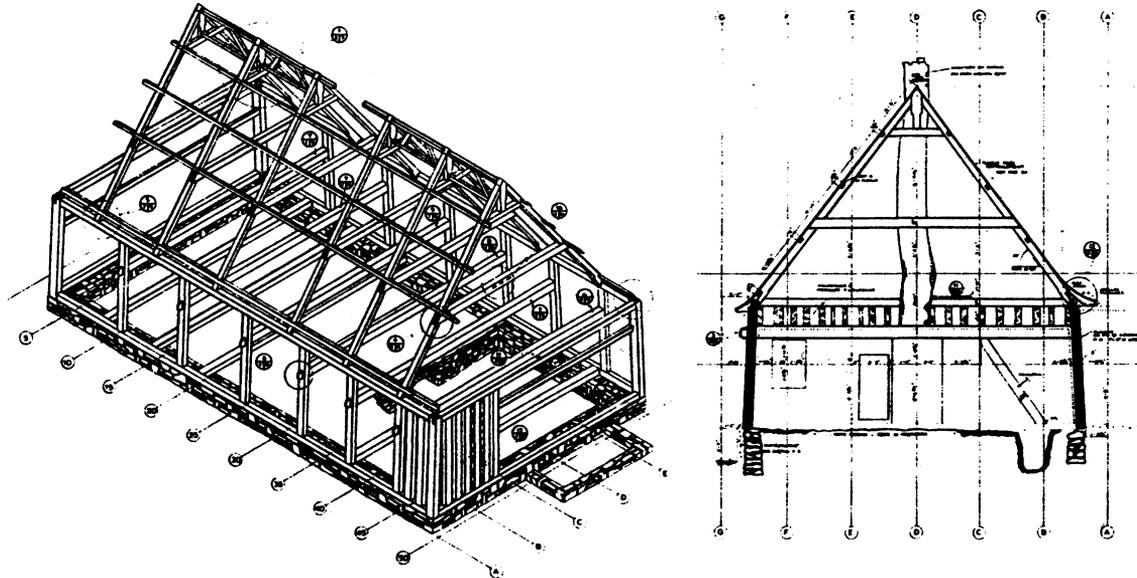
French Canadian timber framing: colombage and anchor-bent framing. Pichet house, Sainte-Famille, Ile d'Orleans, Quebec, eighteenth century. From John Rempel, *Building with Wood and Other Aspects of Nineteenth-Century Building in Central Canada* (Toronto: Toronto University Press, 1980), pp. 142–43.
